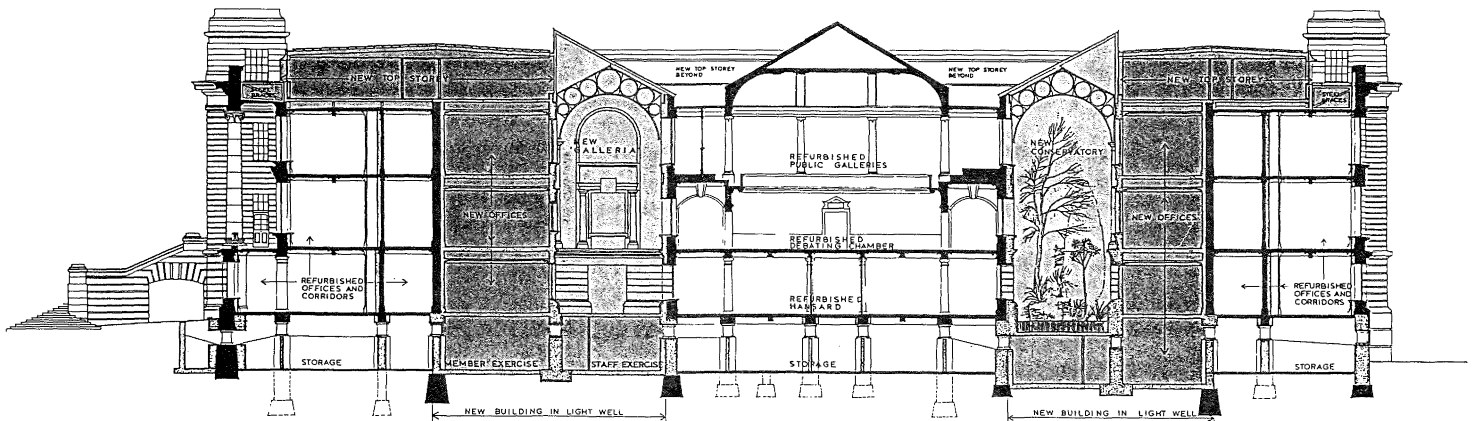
Section through Parliament Building showing proposed strengthening and refurbishment.
